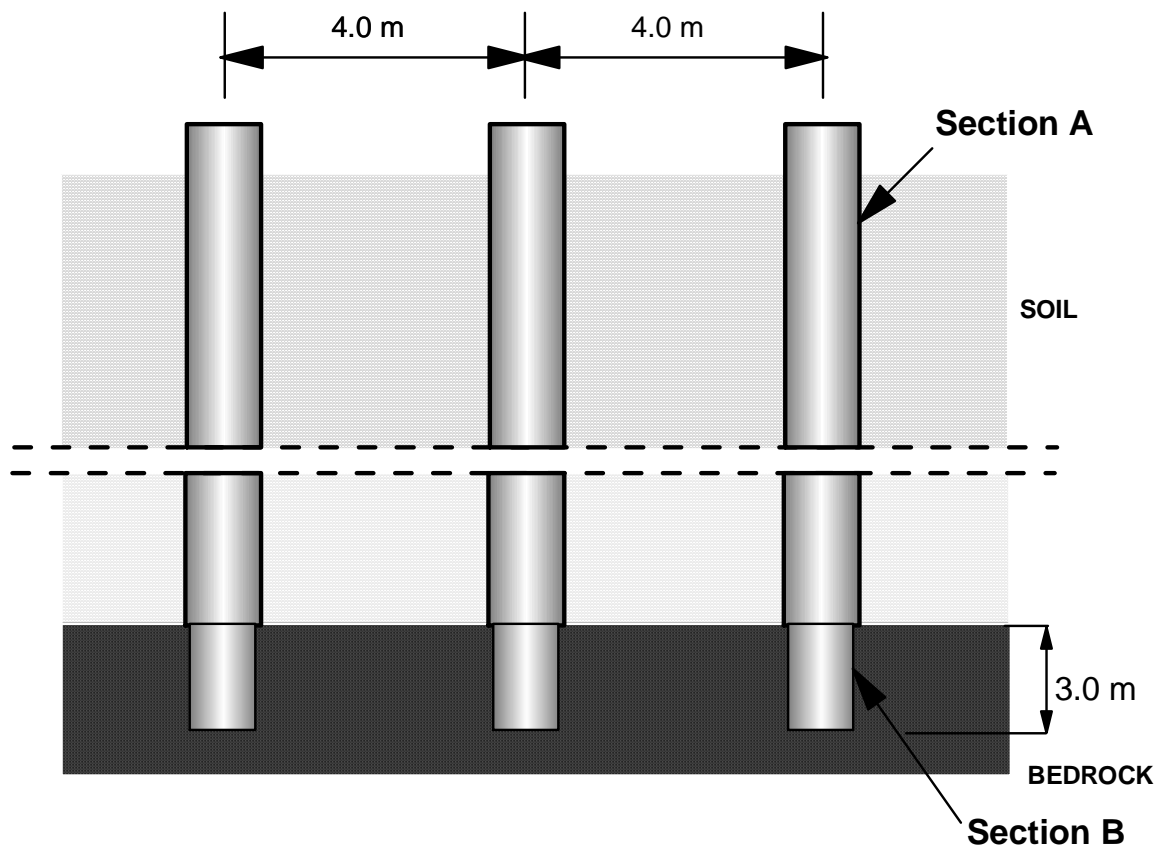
Drilled Shaft Foundations at the Doremus Avenue Bridge
